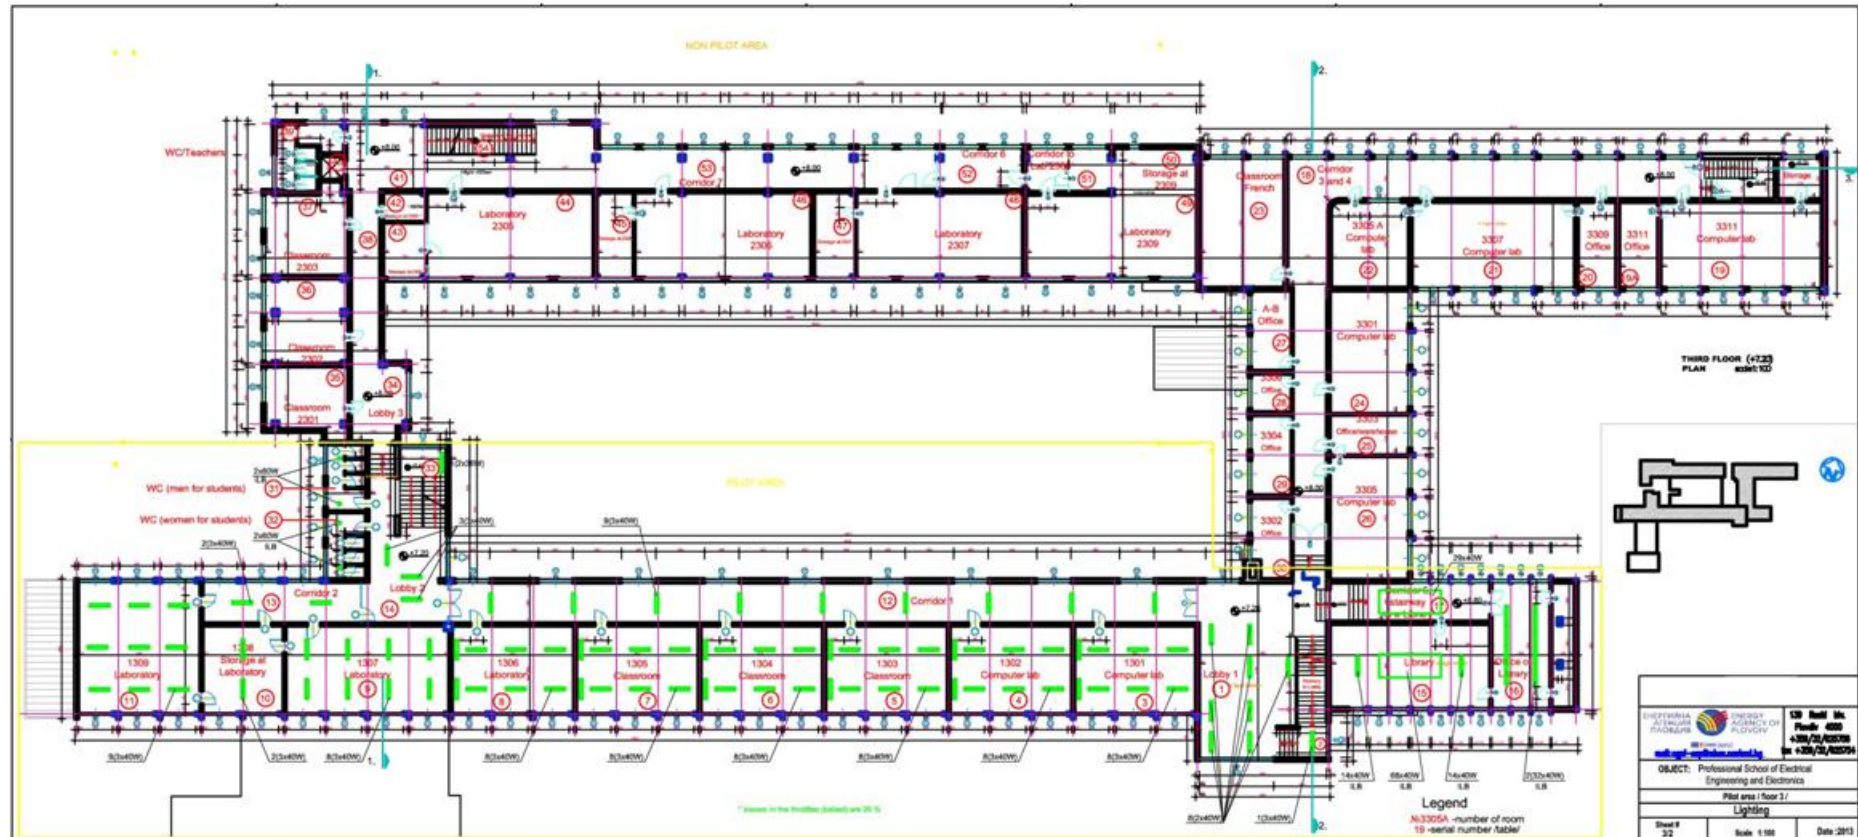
Plovdiv School: 3rd floor lighting plan (Pilot in yellow lines)
